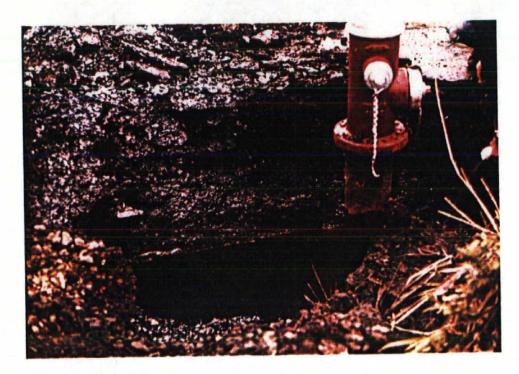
Contaminated Soil & Subsurface Water Exposed during Hydrant Repair. 6/12/85
